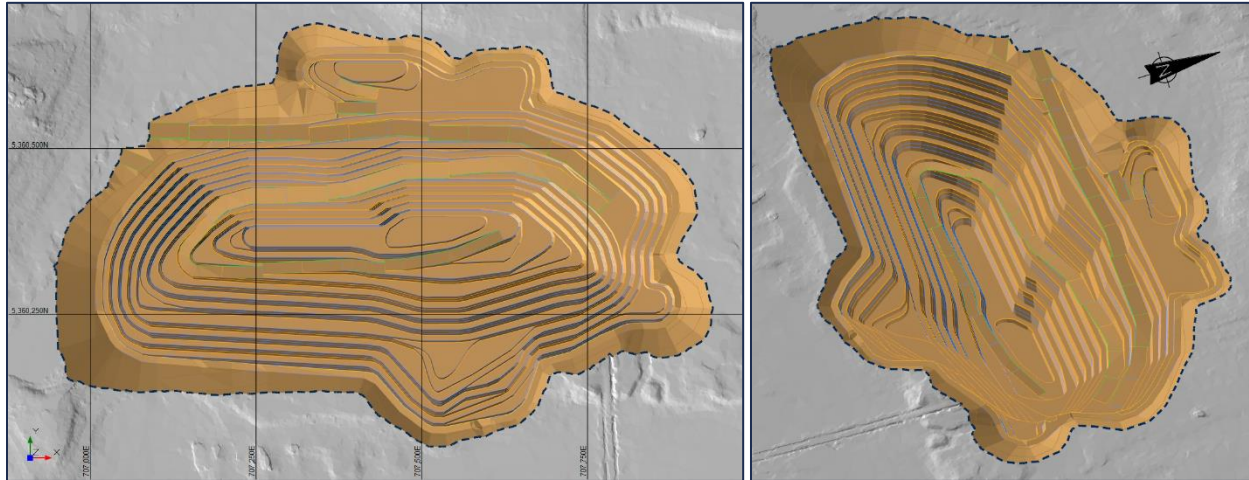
Ultimate Authier Lithium pit – plan and isometric views
